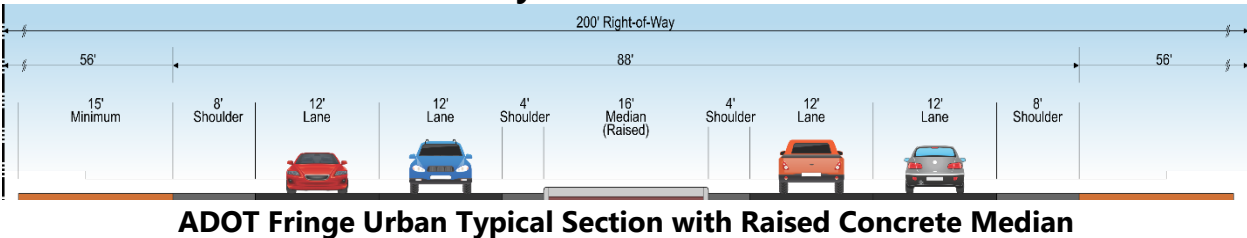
Recommended Typical Section between Road 5N and Sweet Valley Road
